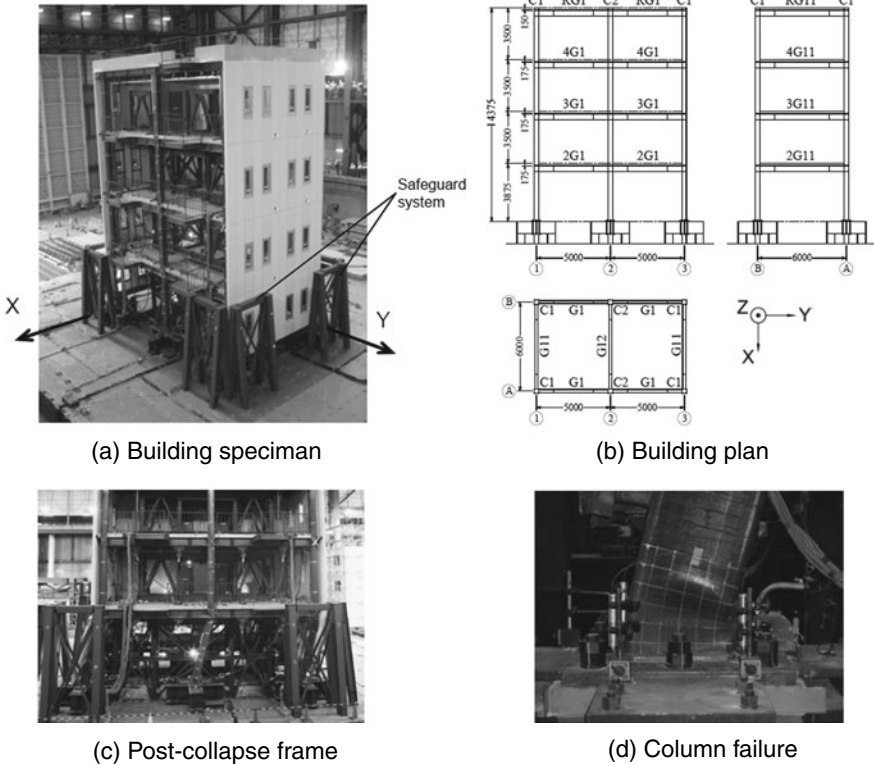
Shake-table test on a full-scale steel moment frame (a) Building specimen, (b) Building plan, (c) Post-collapse frame, (d) Column failure
